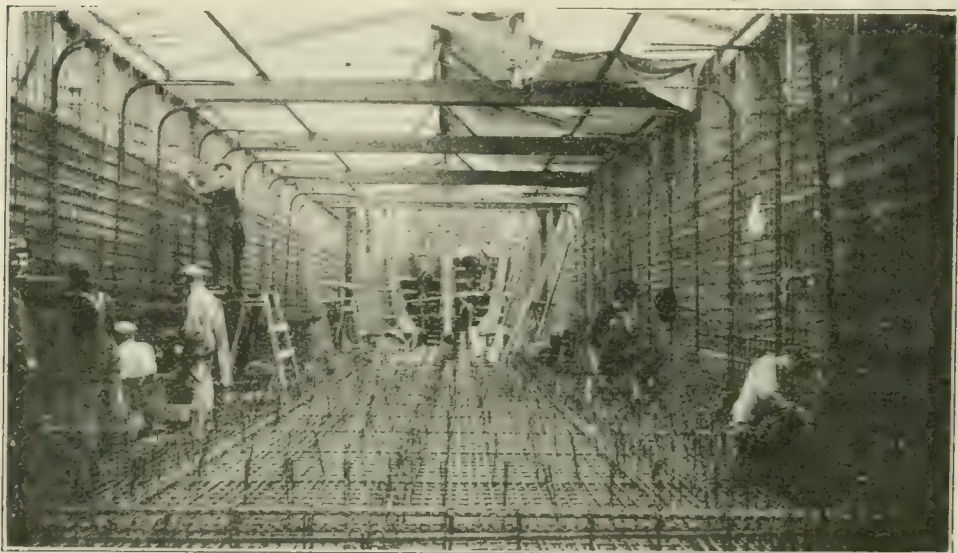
PLACING REINFORCEMENT IN SHELL, TONAWANDA YARD.
